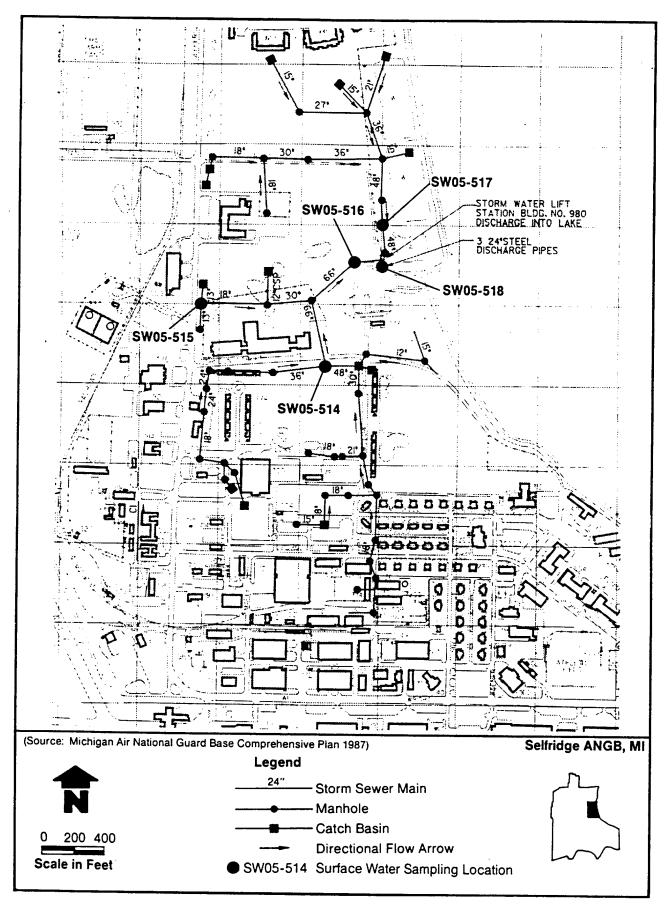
STORMWATER DRAINAGE SYSTEM IN THE TUCKER CREEK LANDFILL AREA
